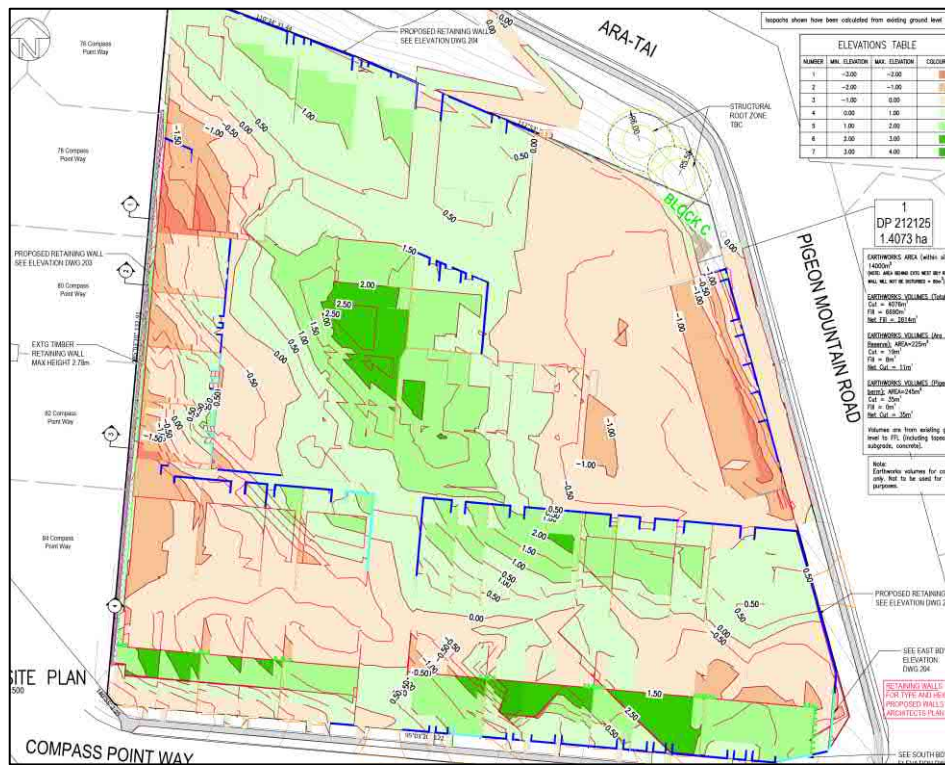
Retaining Wall Plan and Section Position overlying Civil work plan.
